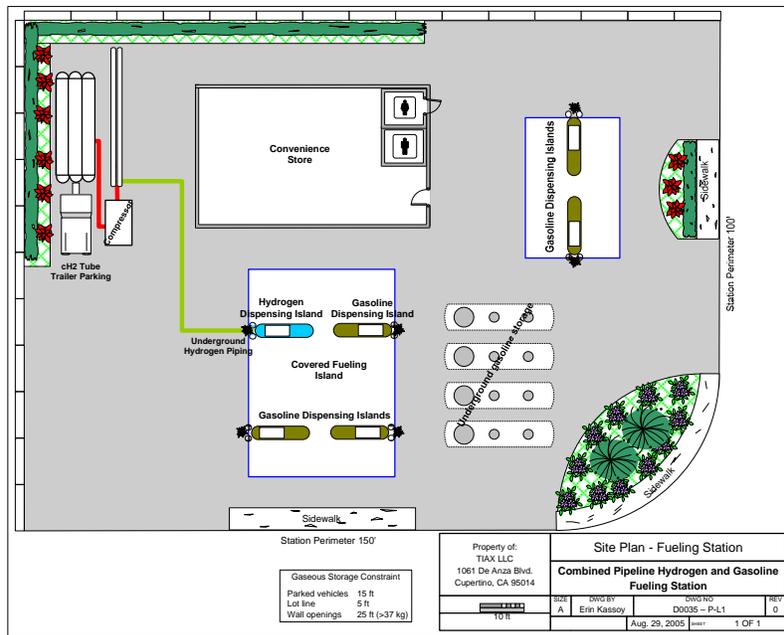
Compressed H2 Tube Trailer Fueling Station Site Plan
